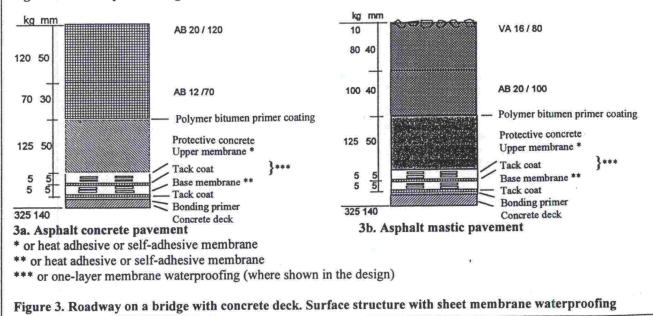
Roadway on a bridge with concrete deck. Surface structure with sheet membrane waterproofing
